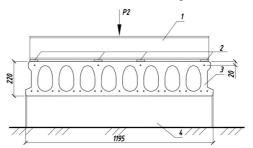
The geometric dimensions and reinforcement of hollow-core slabs: 1 – distribution traverse; 2 – steel plate; 3 – hollow-core slabs; 4 – wall panel
